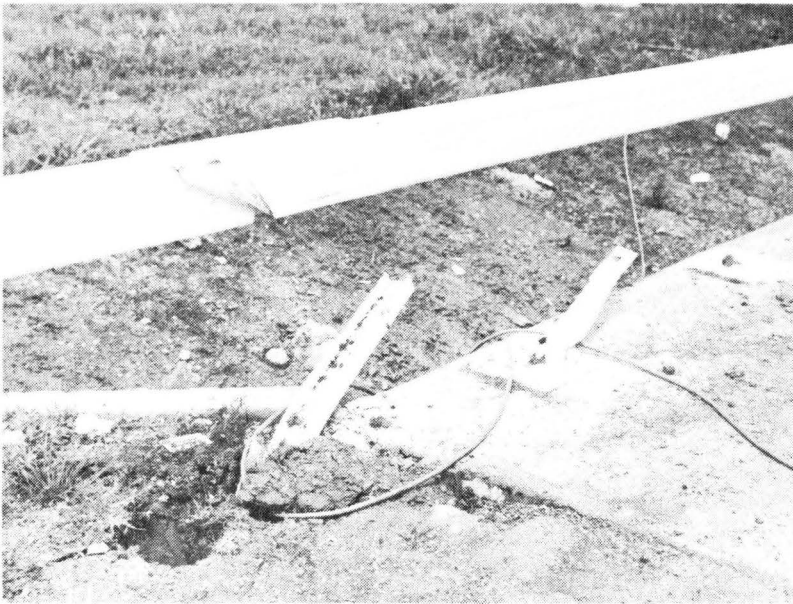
, Damage at Bridge Rail-Guardrail Transition, Test NY-B.
